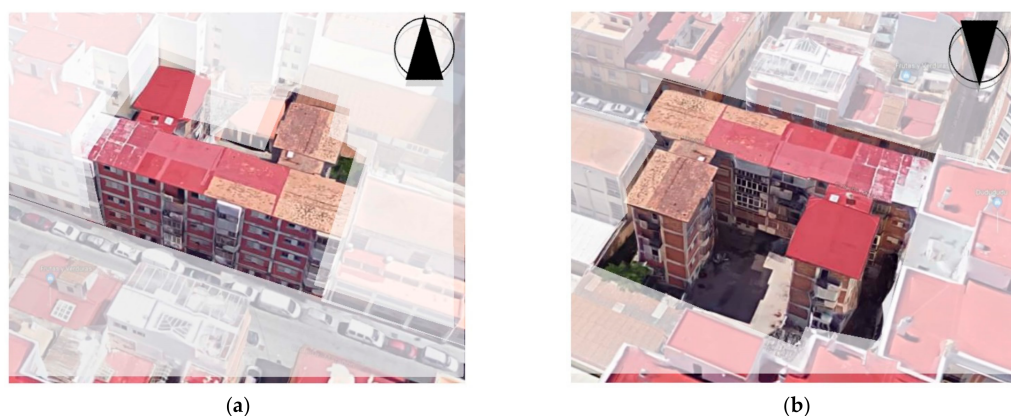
3D-view of the building: (a) south-facing façade and (b) north-facing façade.
